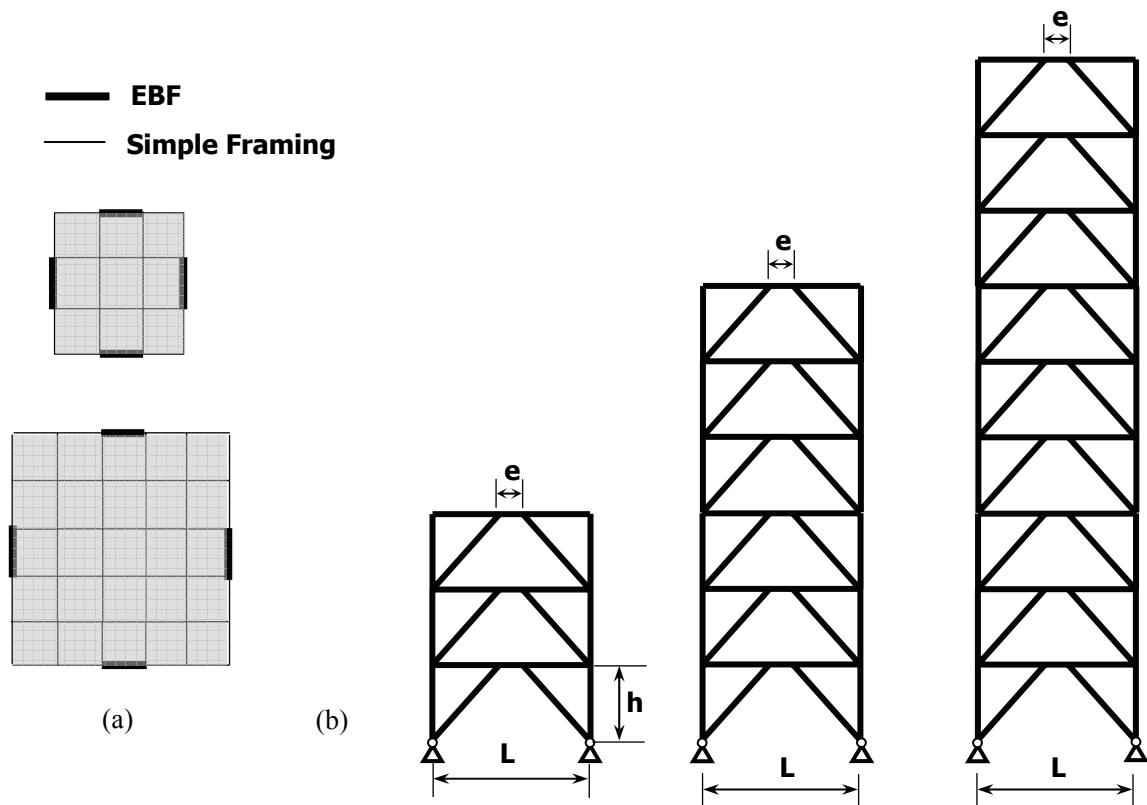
Properties of the model frames (a) Plan views of buildings (b) Elevation views of frames
